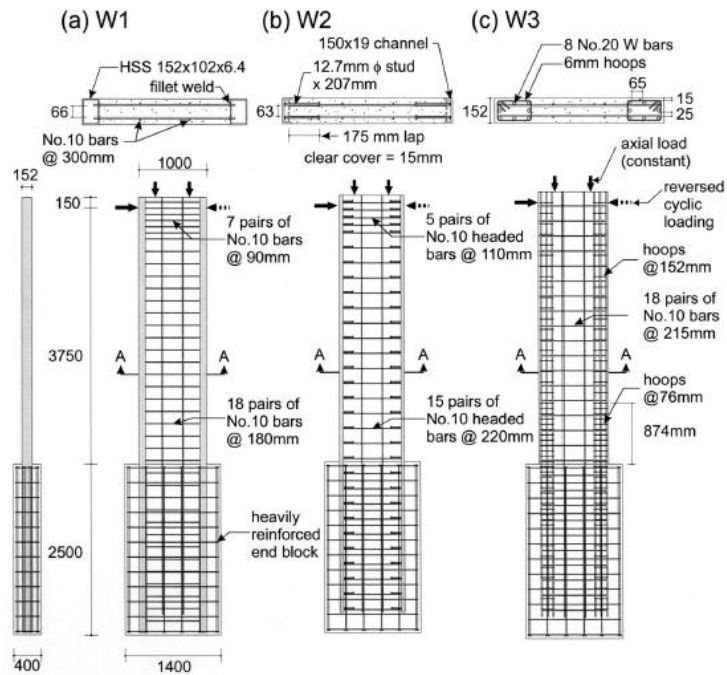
Tested Composite Reinforced Concrete Wall Specimens, Cho et al (2004)
